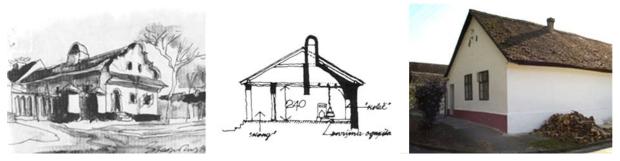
Examples of rammed earth houses from Vojvodina and a cross section through a kitchen
